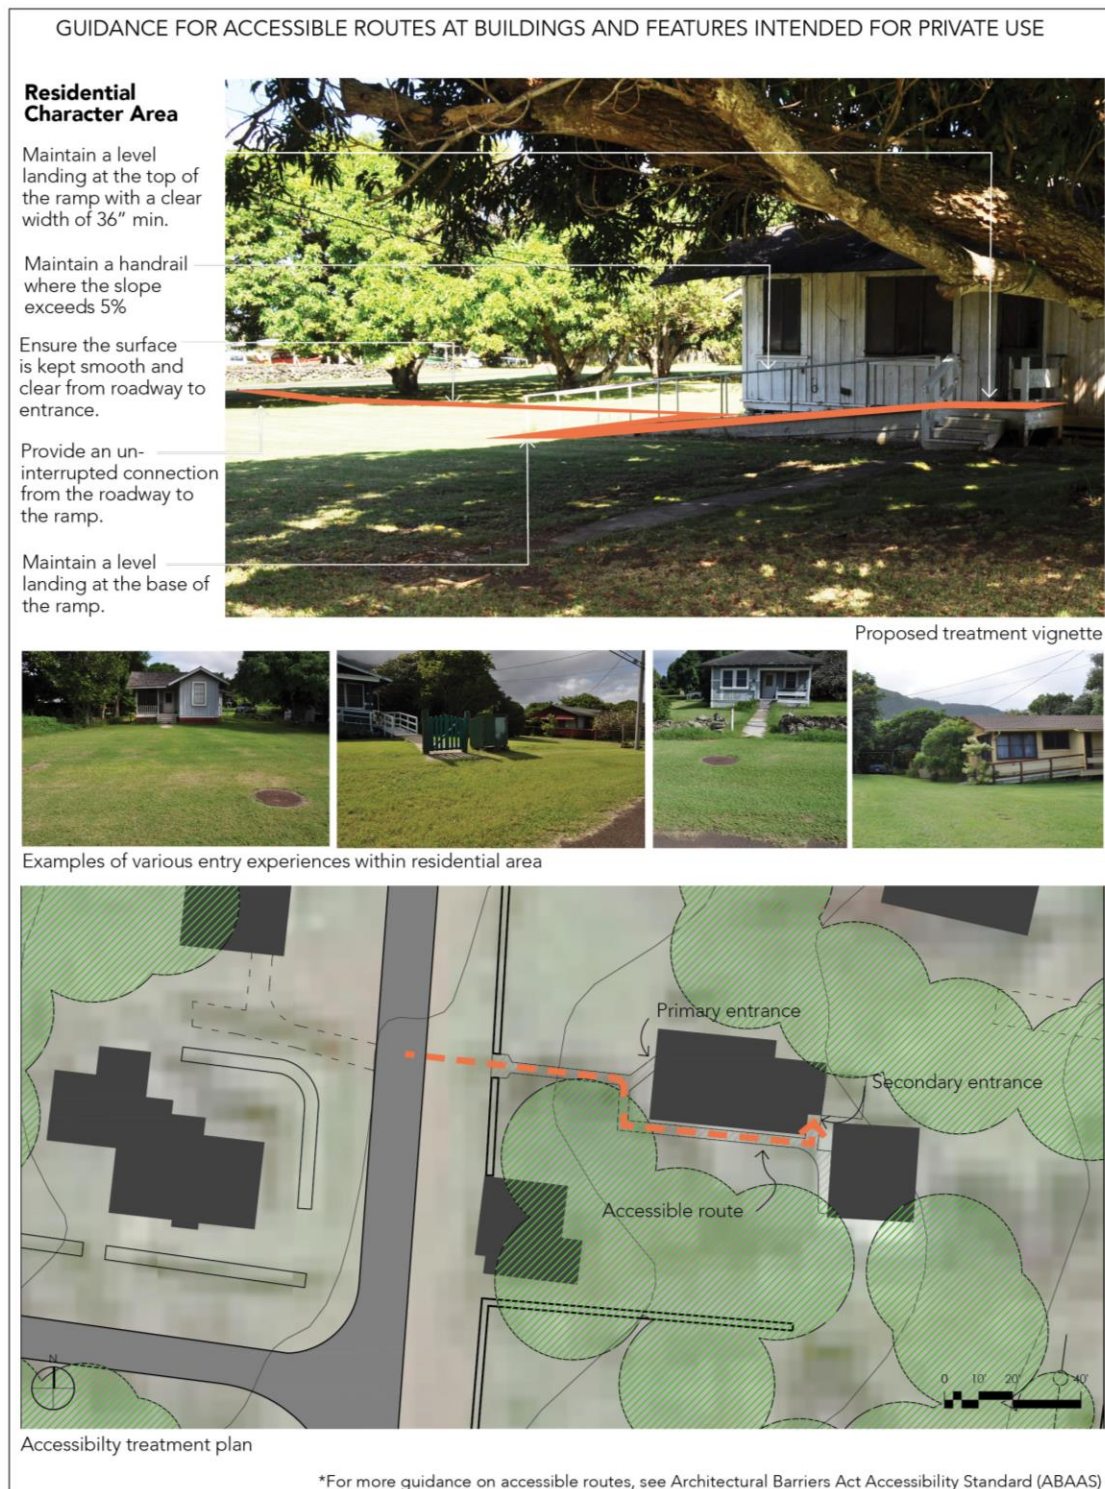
Additional guidelines for ramps for buildings for private use. (Source: LSHLA)
